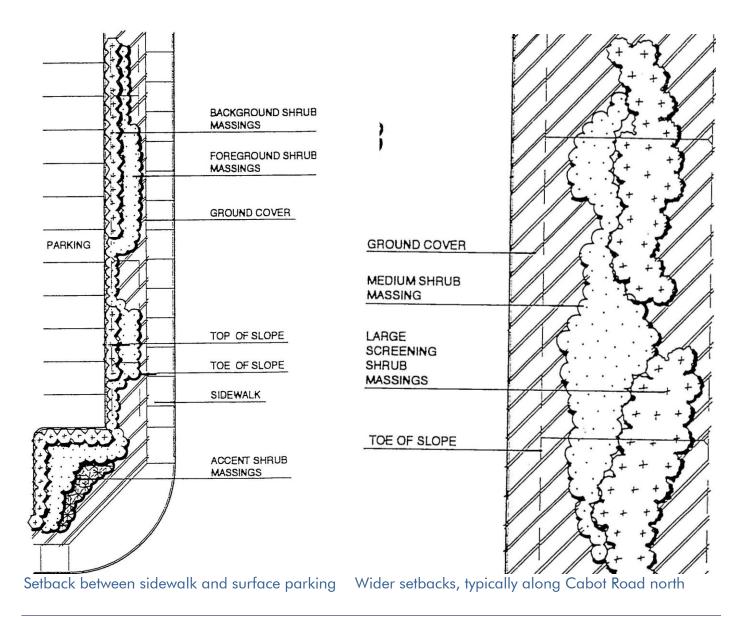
Typical Setback Landscaping Except on Forbes Road and Other Pedestrian-Oriented Retail Streets
